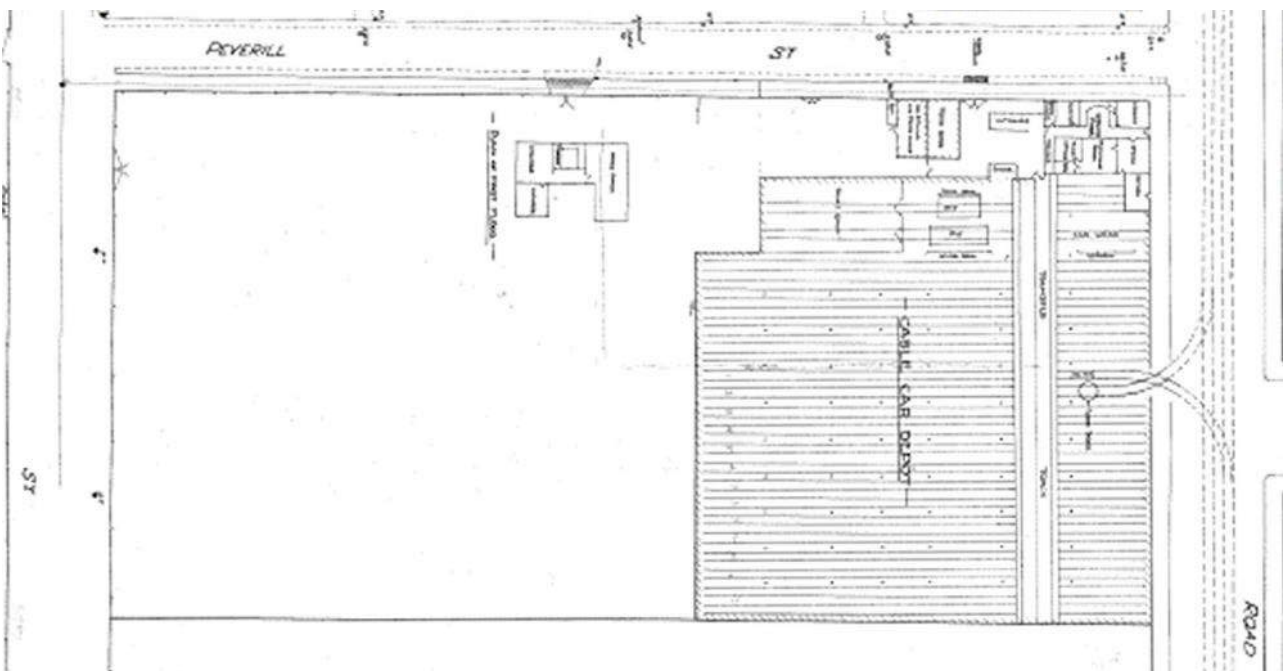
Detail from the 1931 MMTB plan of the Sydney Road cable car depot (Jacobs 2020)
